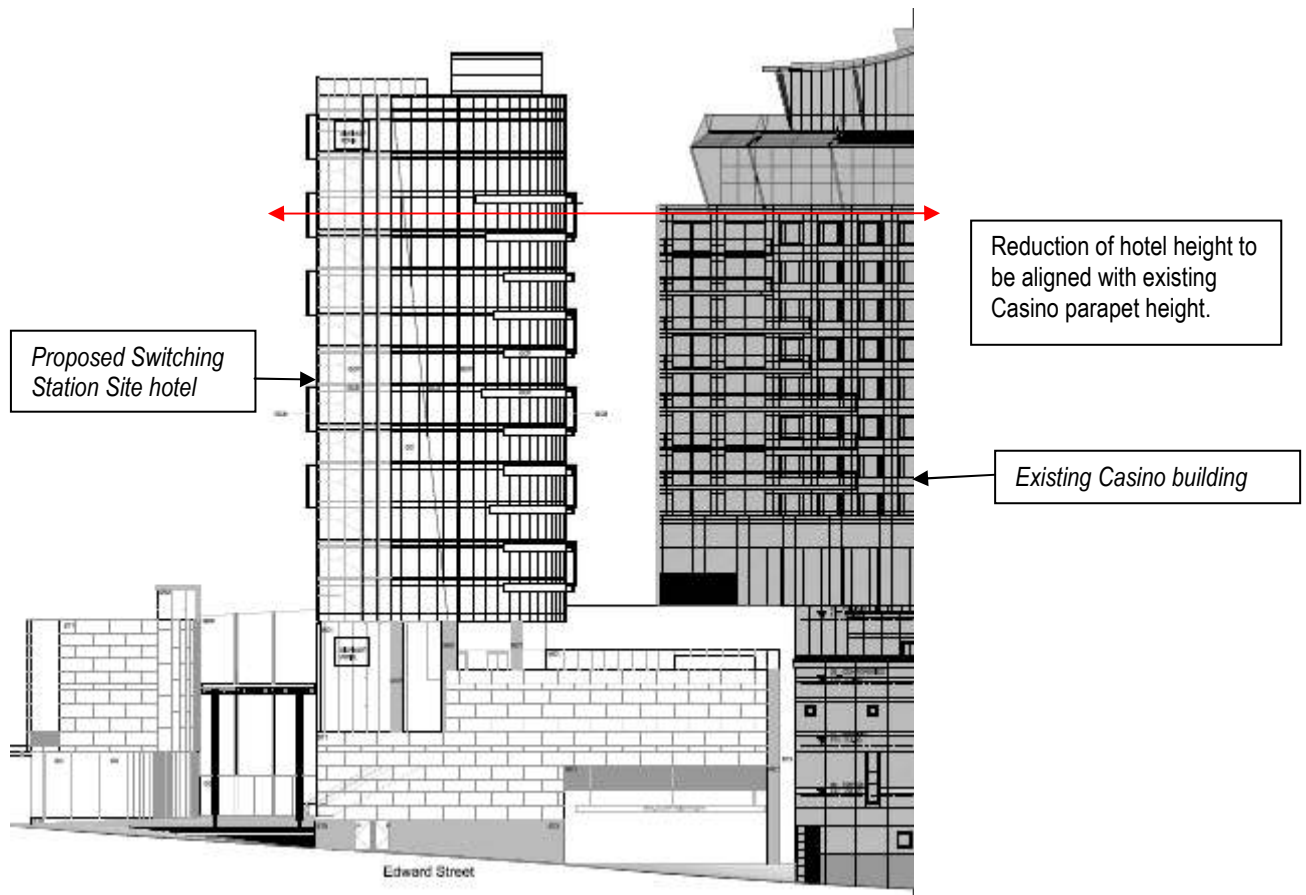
Hotel tower elevation relative to existing Casino tower height.
